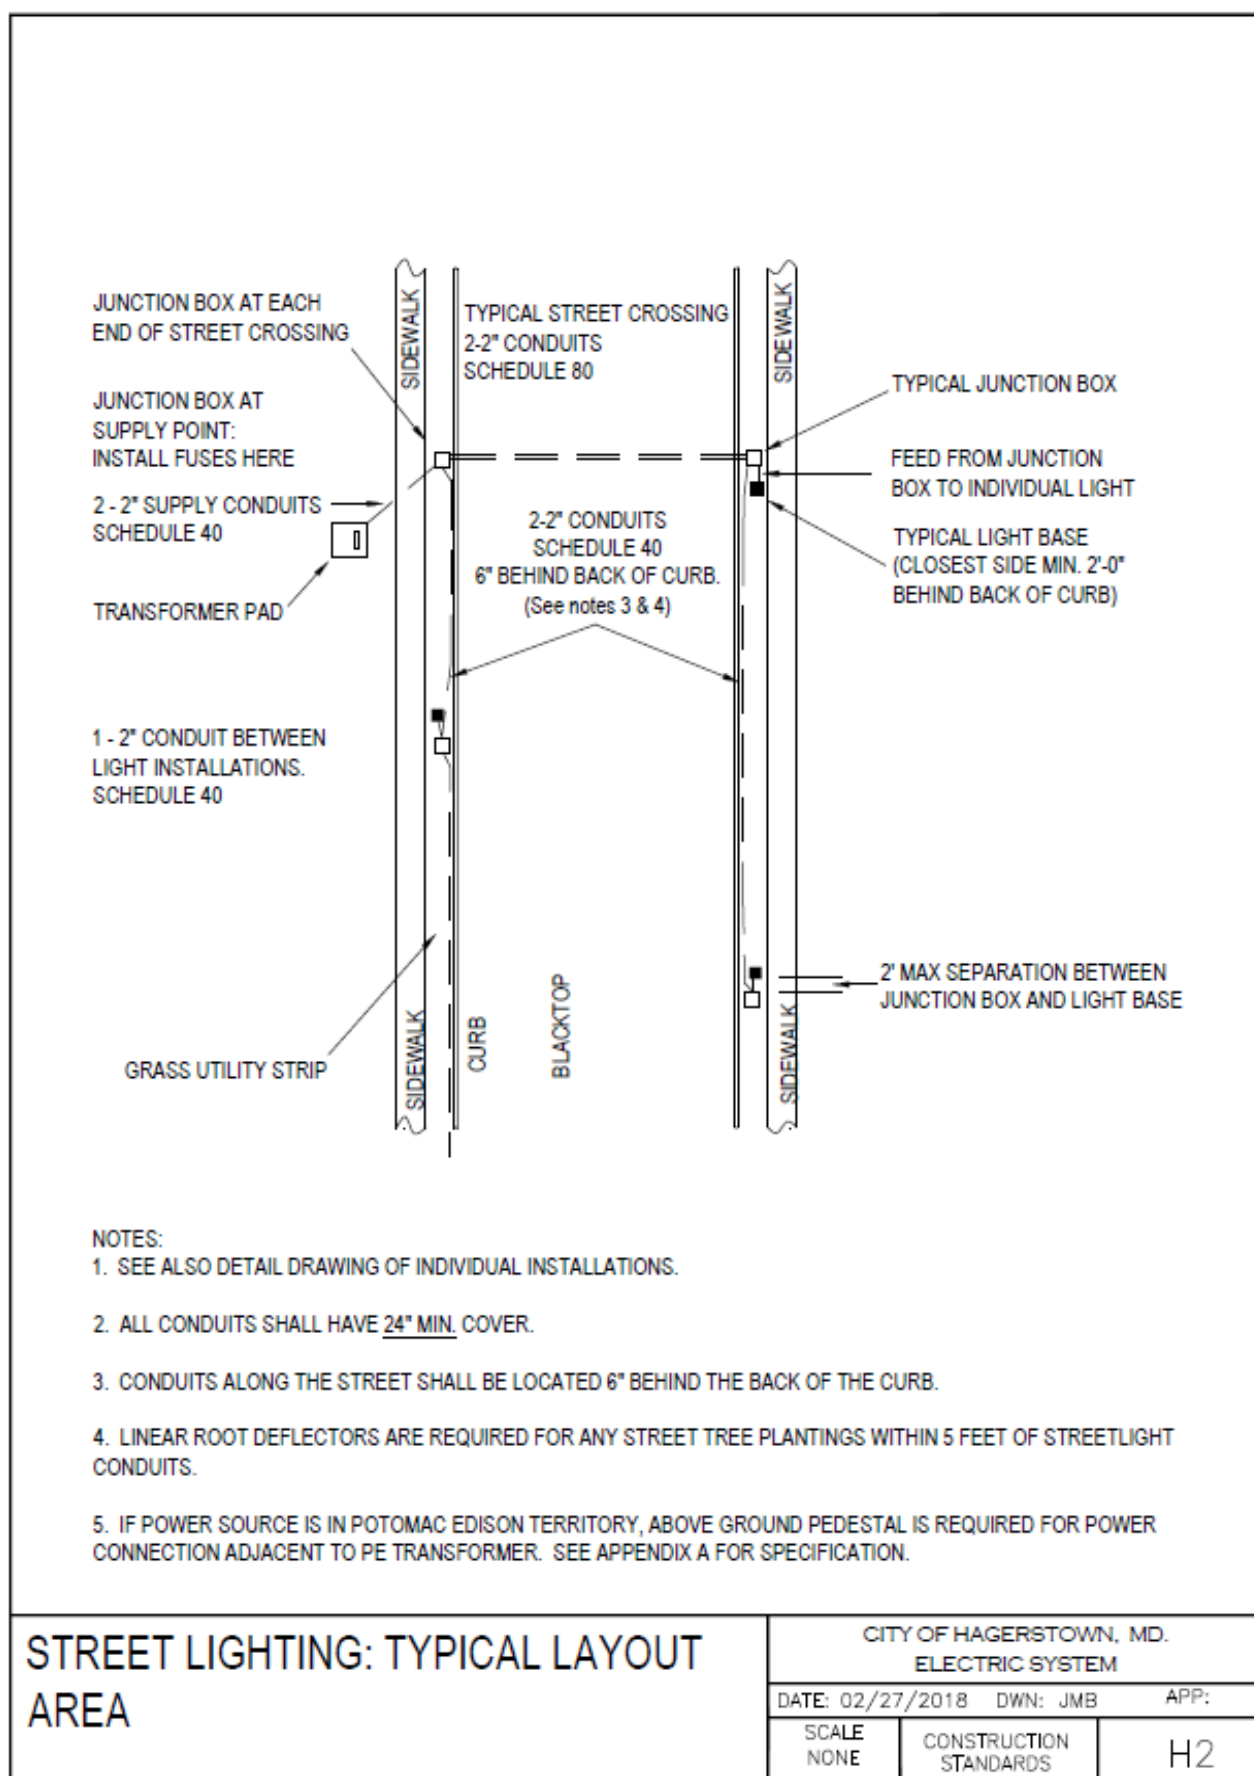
Typical Layout for Streetlight Pole Installations and the Essential Requirements
